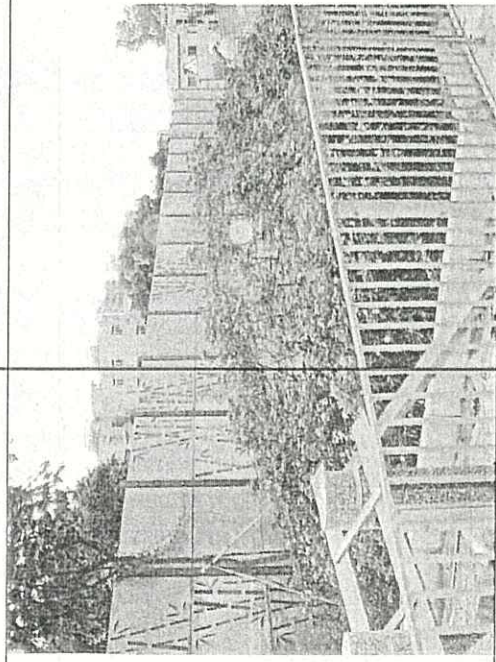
Completion of Landscaping Works at New Road L1 of Long Yat Road (YUL)
